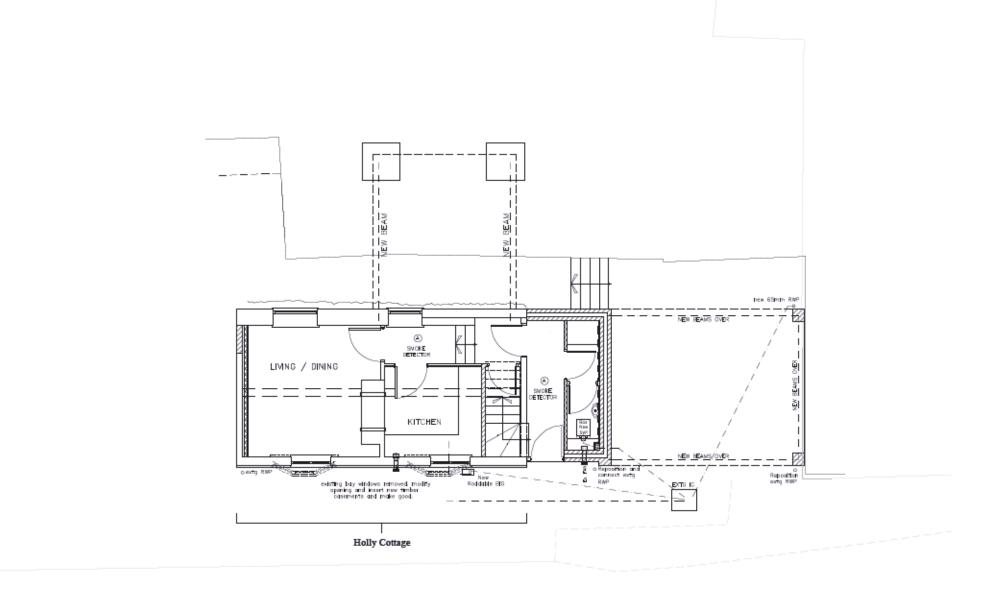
Phased Existing First Floor Plan showing Plate Directions 1:100 at A3 Proposed First Floor Plan (Garden Level)
